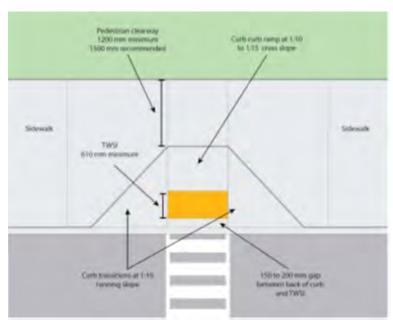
SIDEWALK TREATMENT AT CURB RAMPS FOR CROSSWALKS
